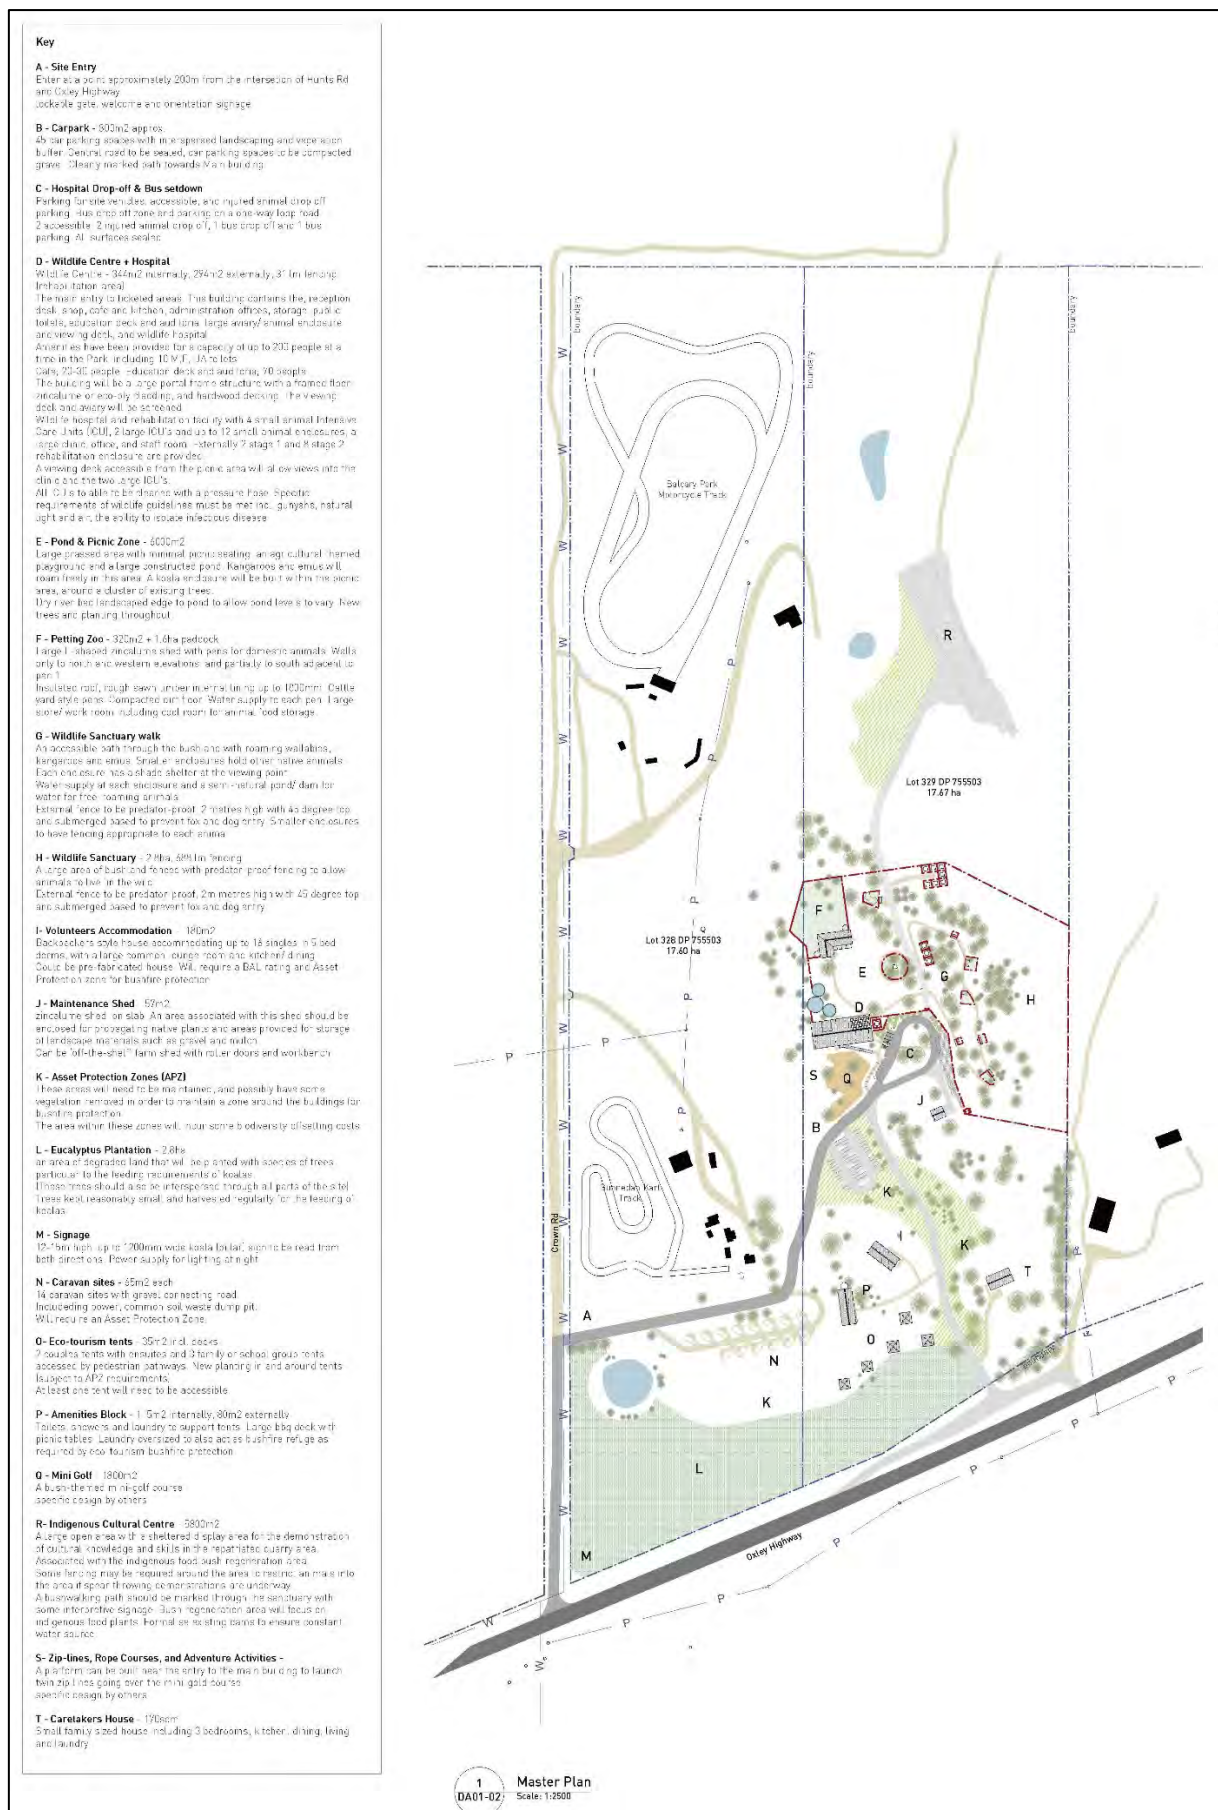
Architectural Site Plan (Dunn & Hilliam Architects)
